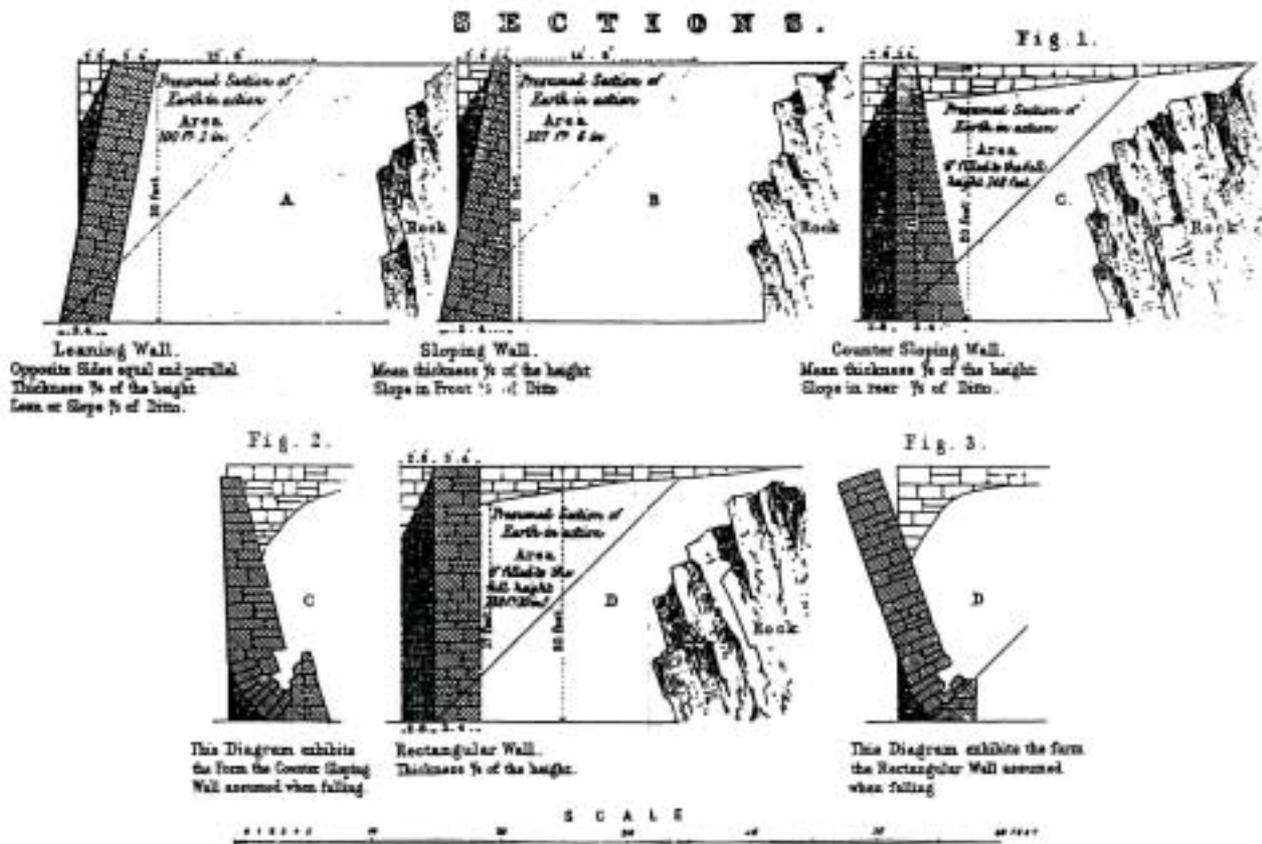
Cross-sections and failure mechanisms of walls tested by General J Burgoyne in 1834 (from Burgoyne, 1853)
